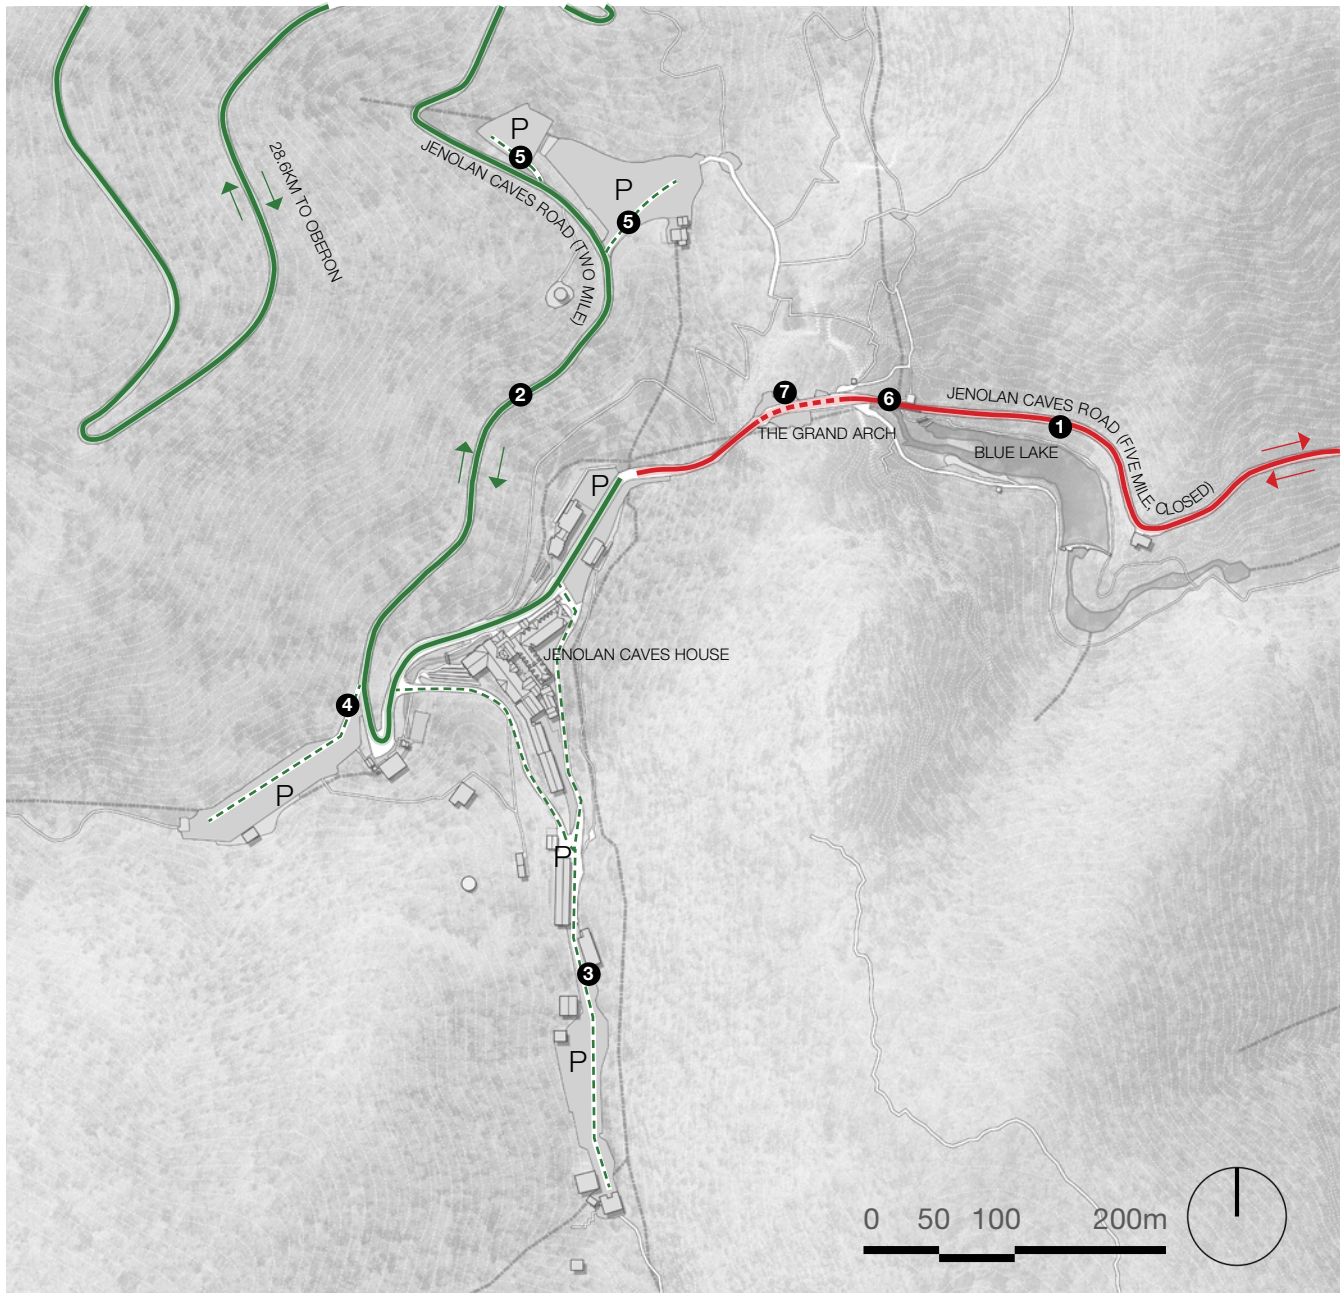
Existing site plan showing extent of precincts included in the master plan
